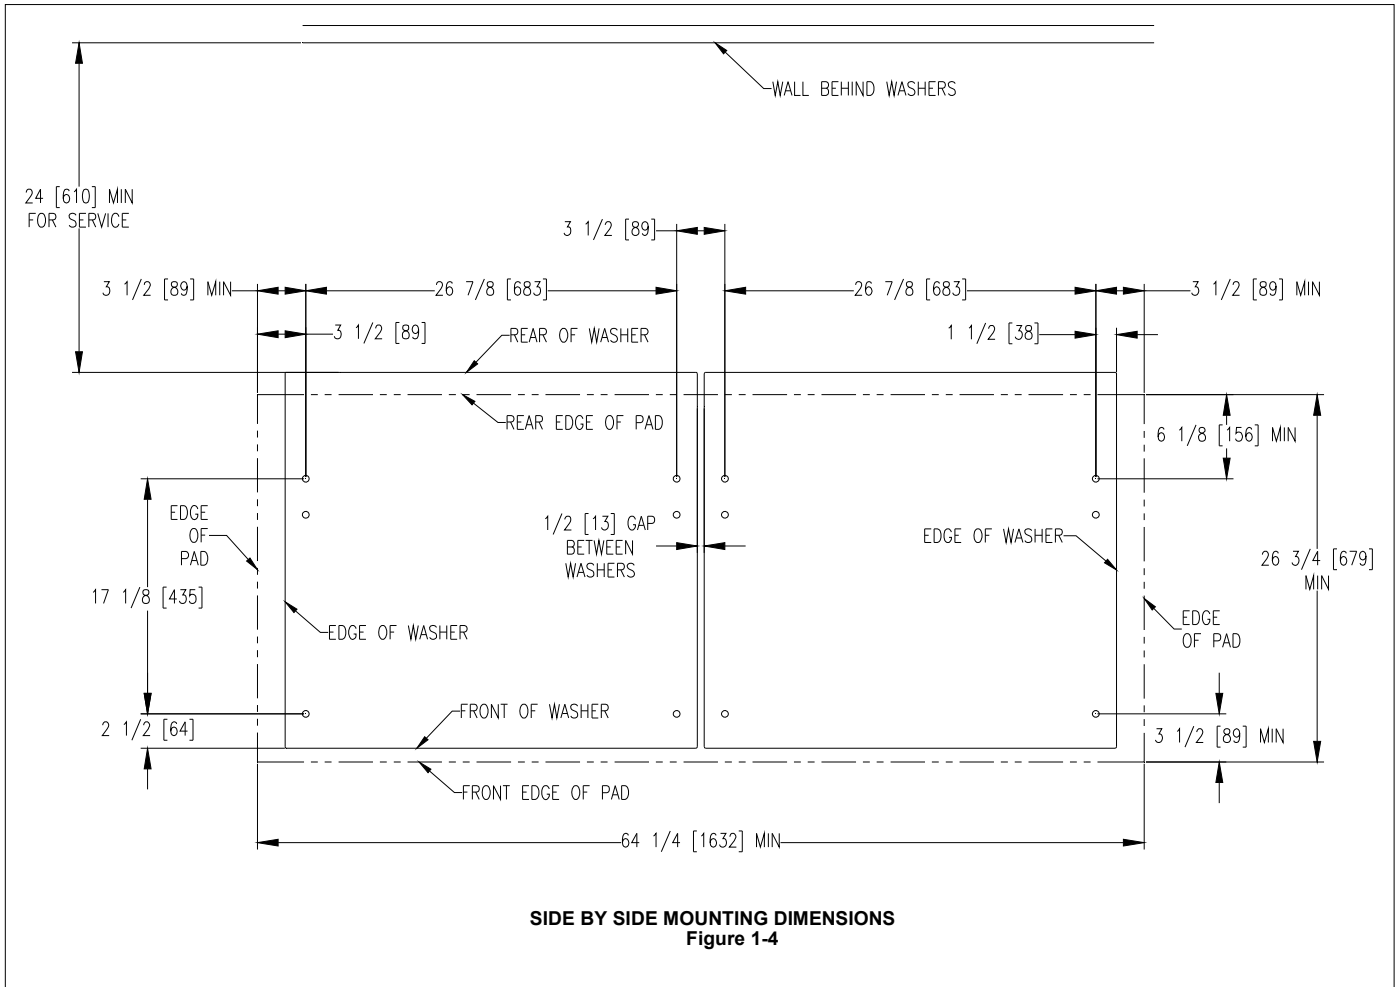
T-400 Machine Side By Side Mounting Detail
